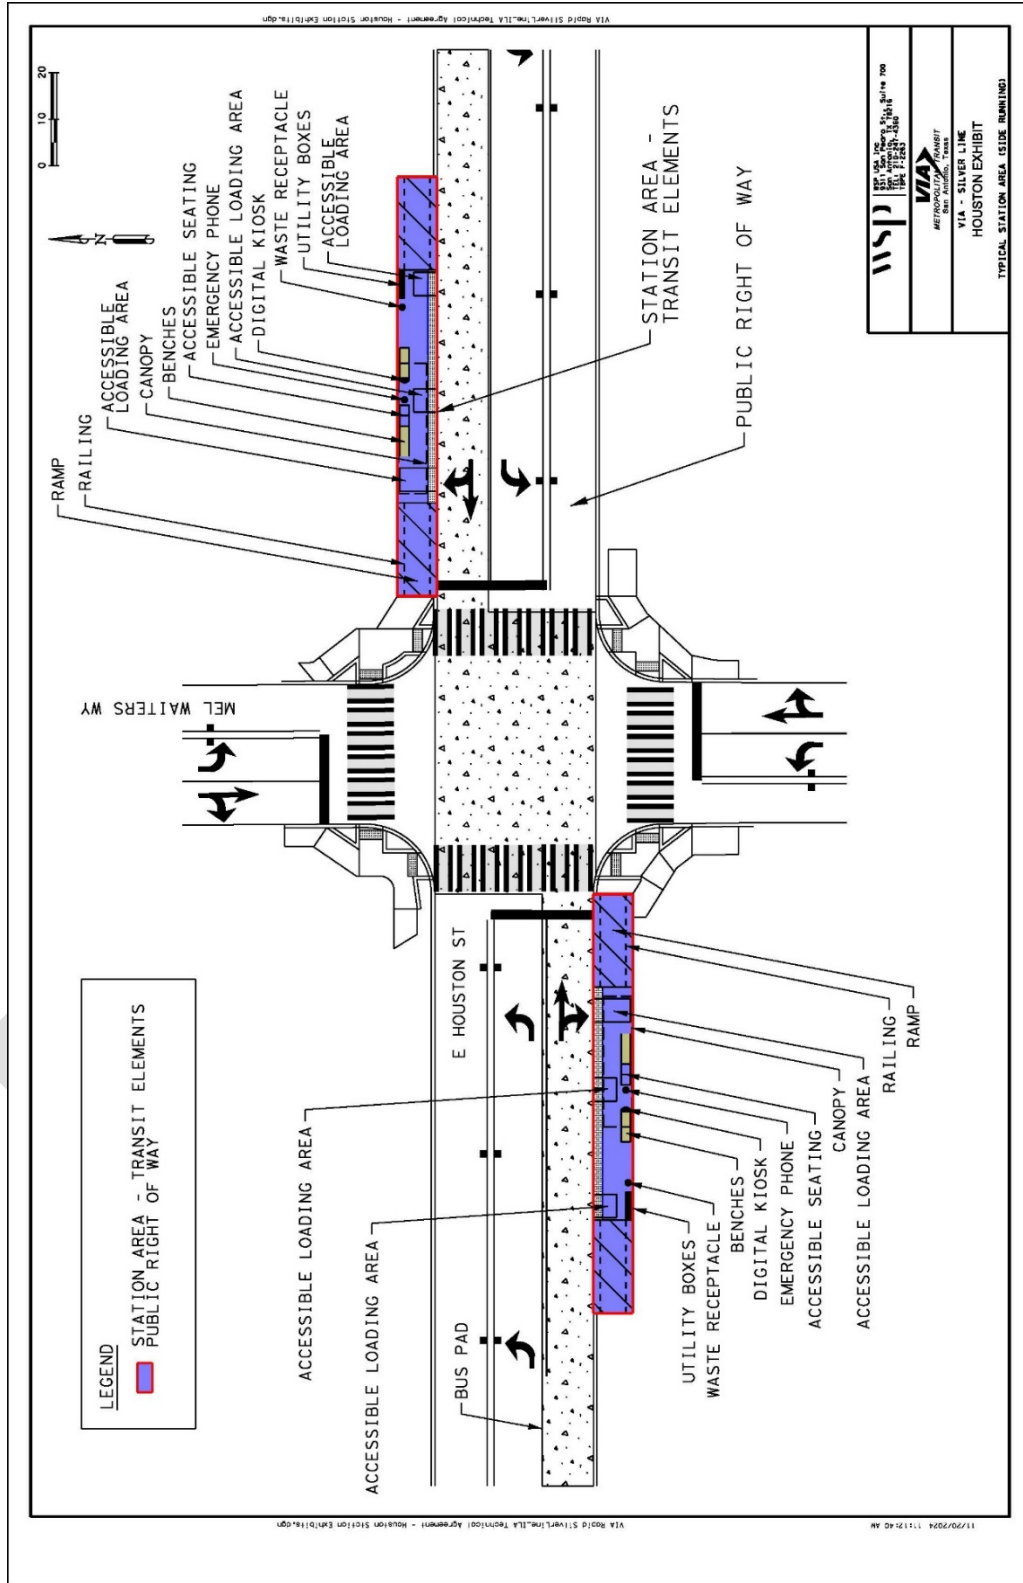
Transit Elements at Mel Waiters Way Station on East Houston Street
